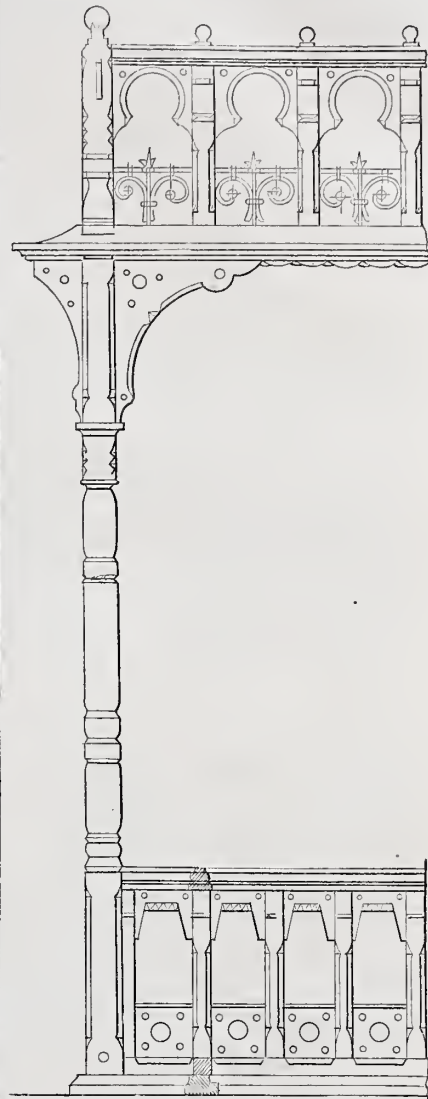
Elevation of Porches.—Scale, $\frac{3}{8}$ Inch to the Foot.
